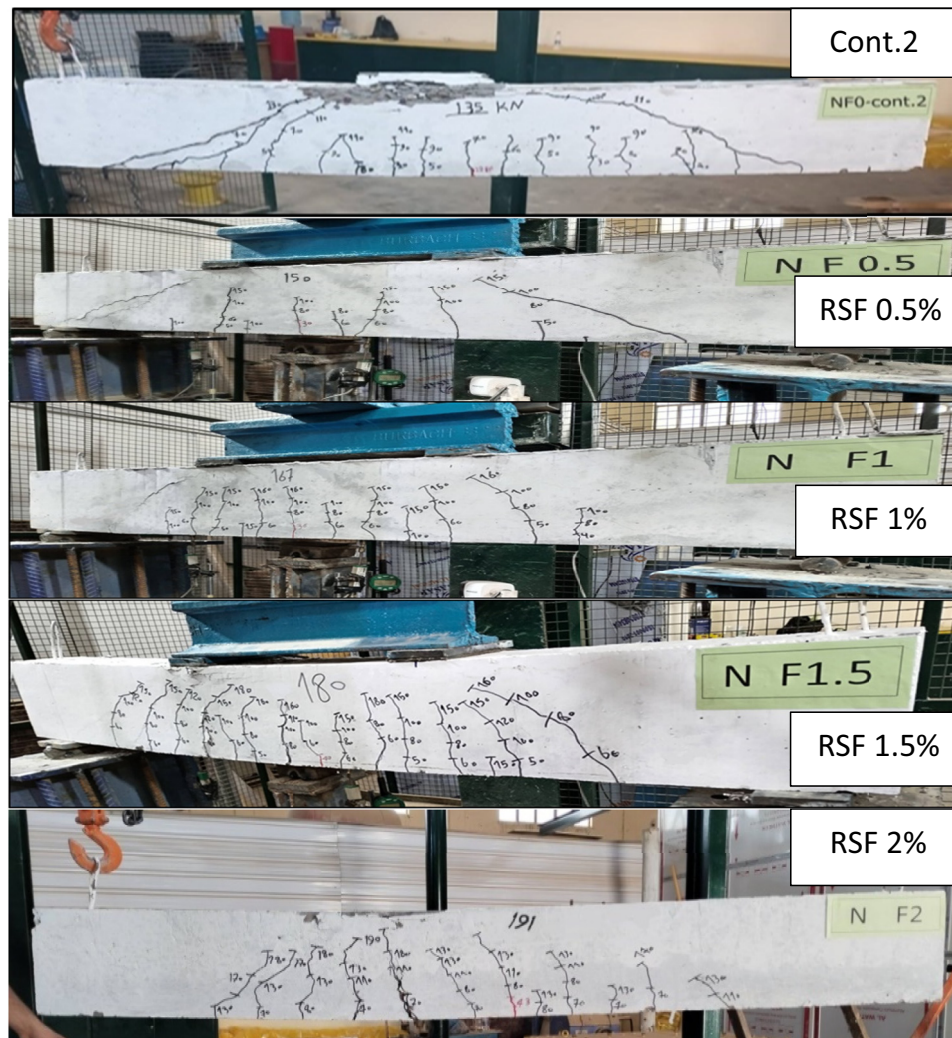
Crack pattern and failure modes of beams with stirrup.
